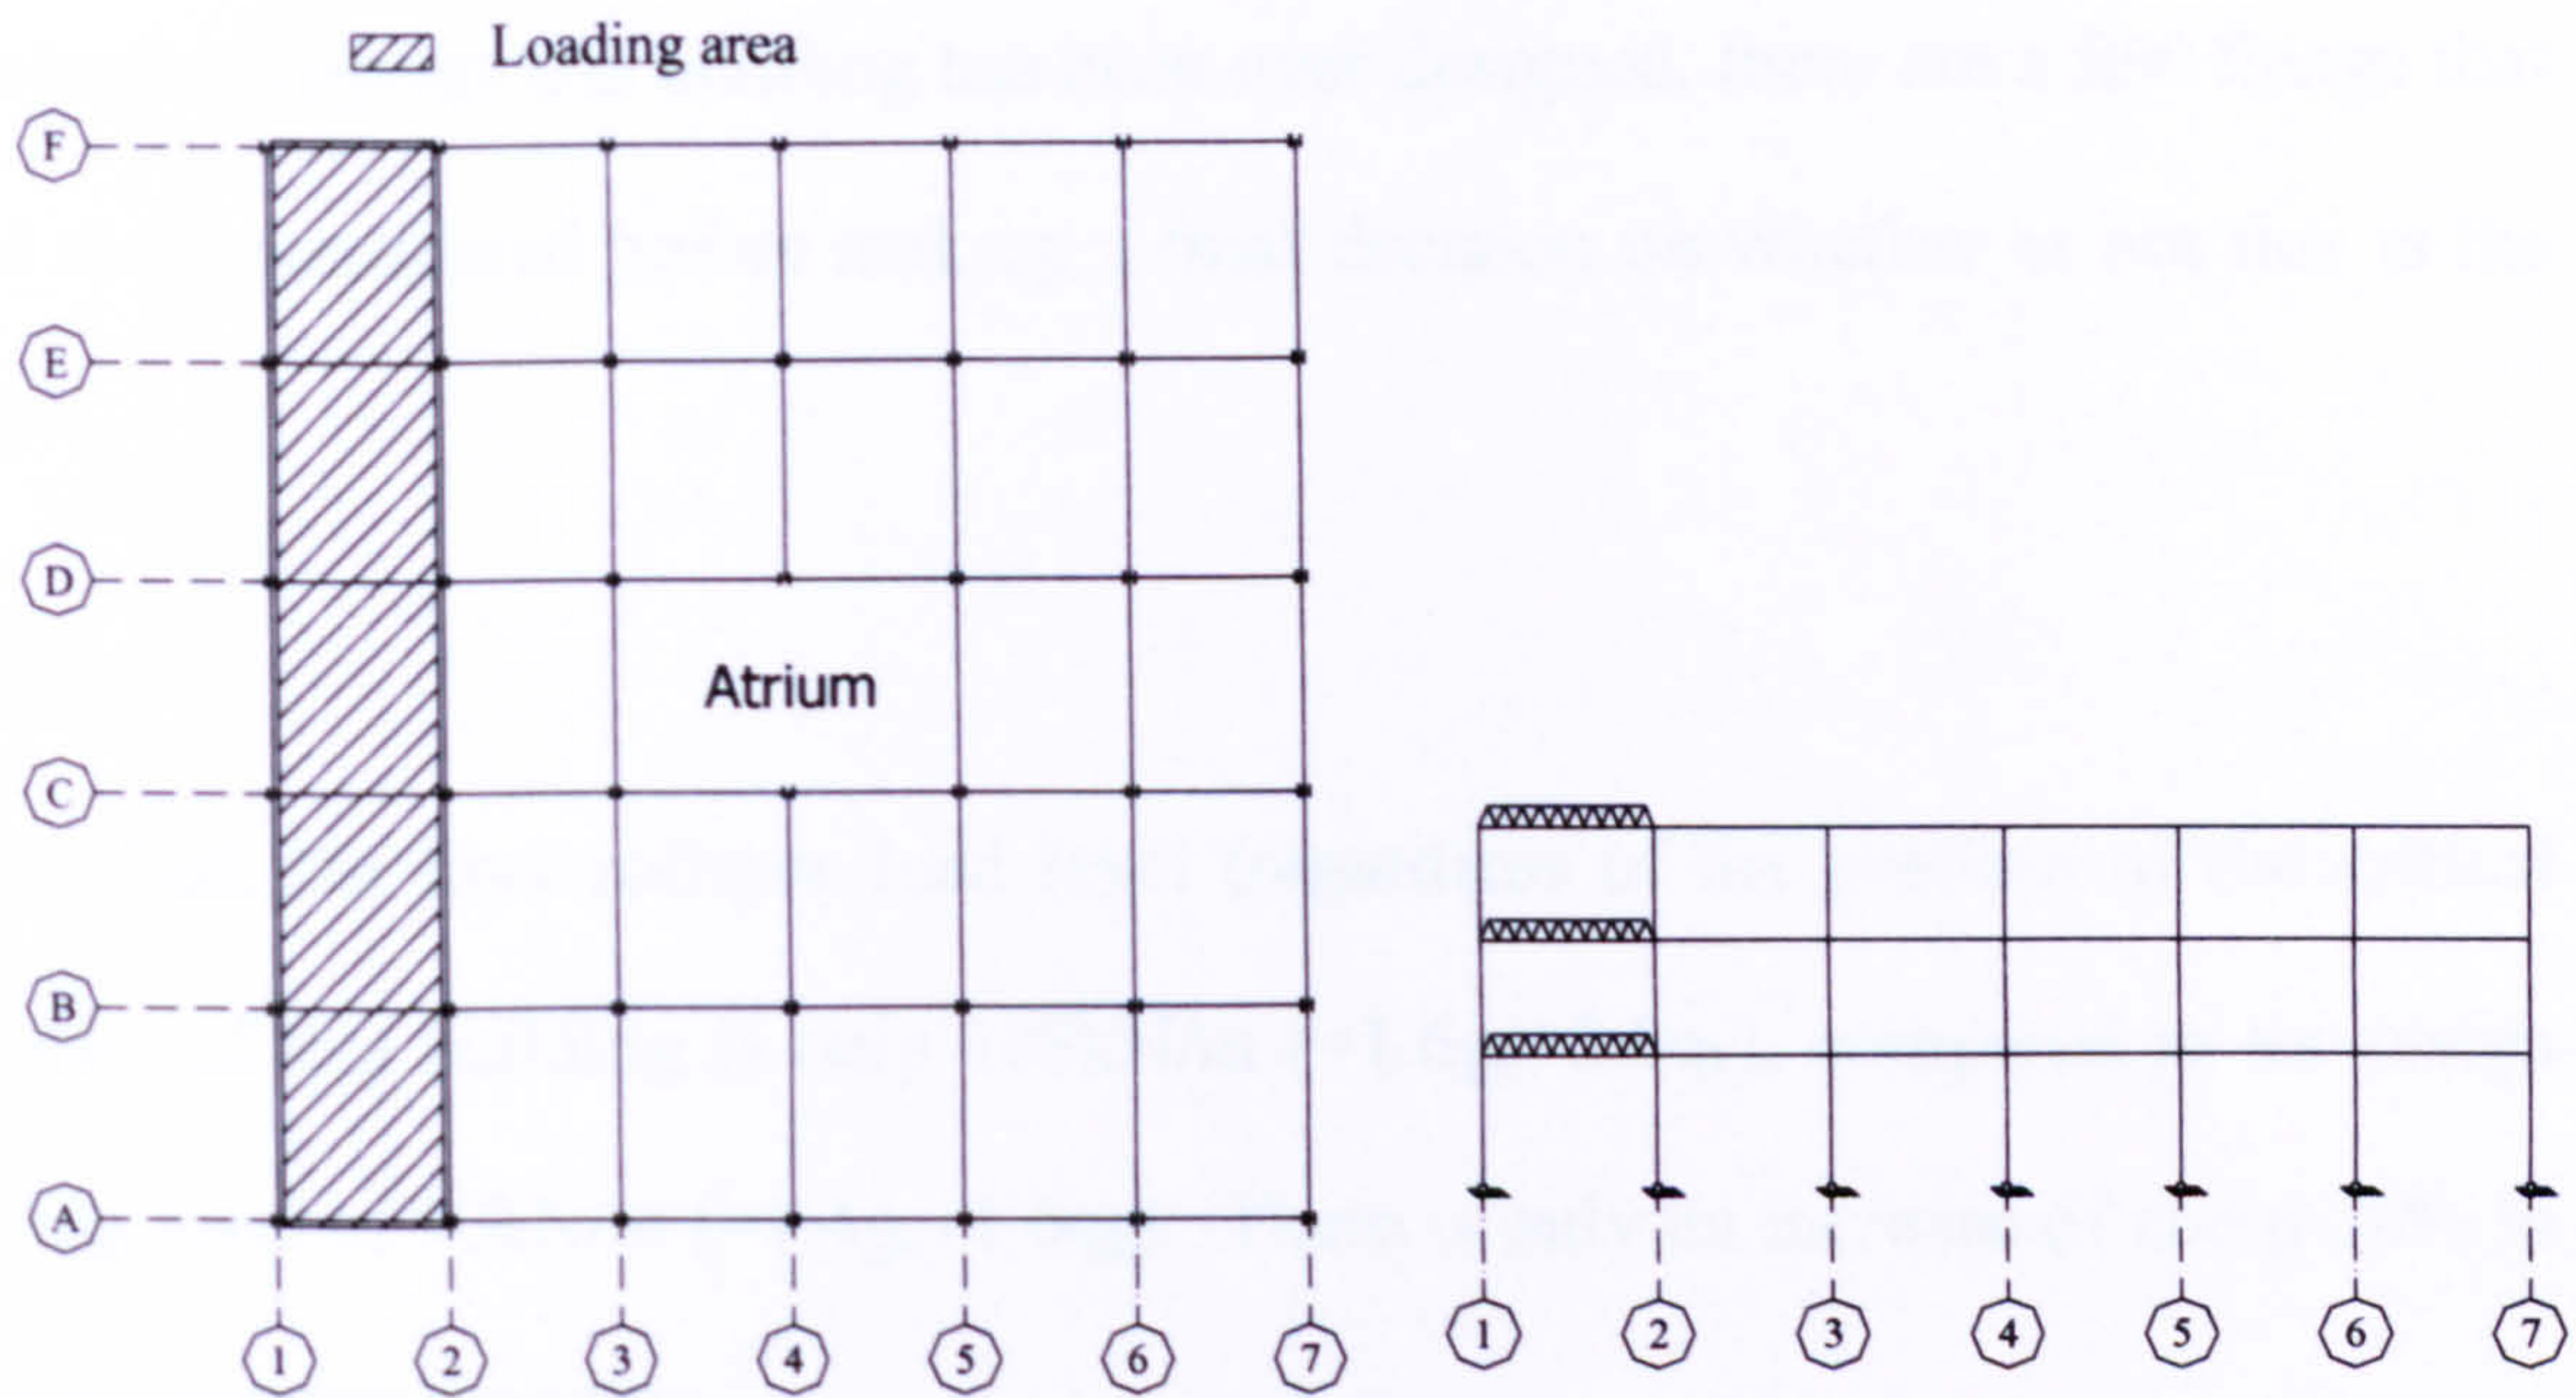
Illustration for numerical tests to determine the collapse loading level for edge columns
